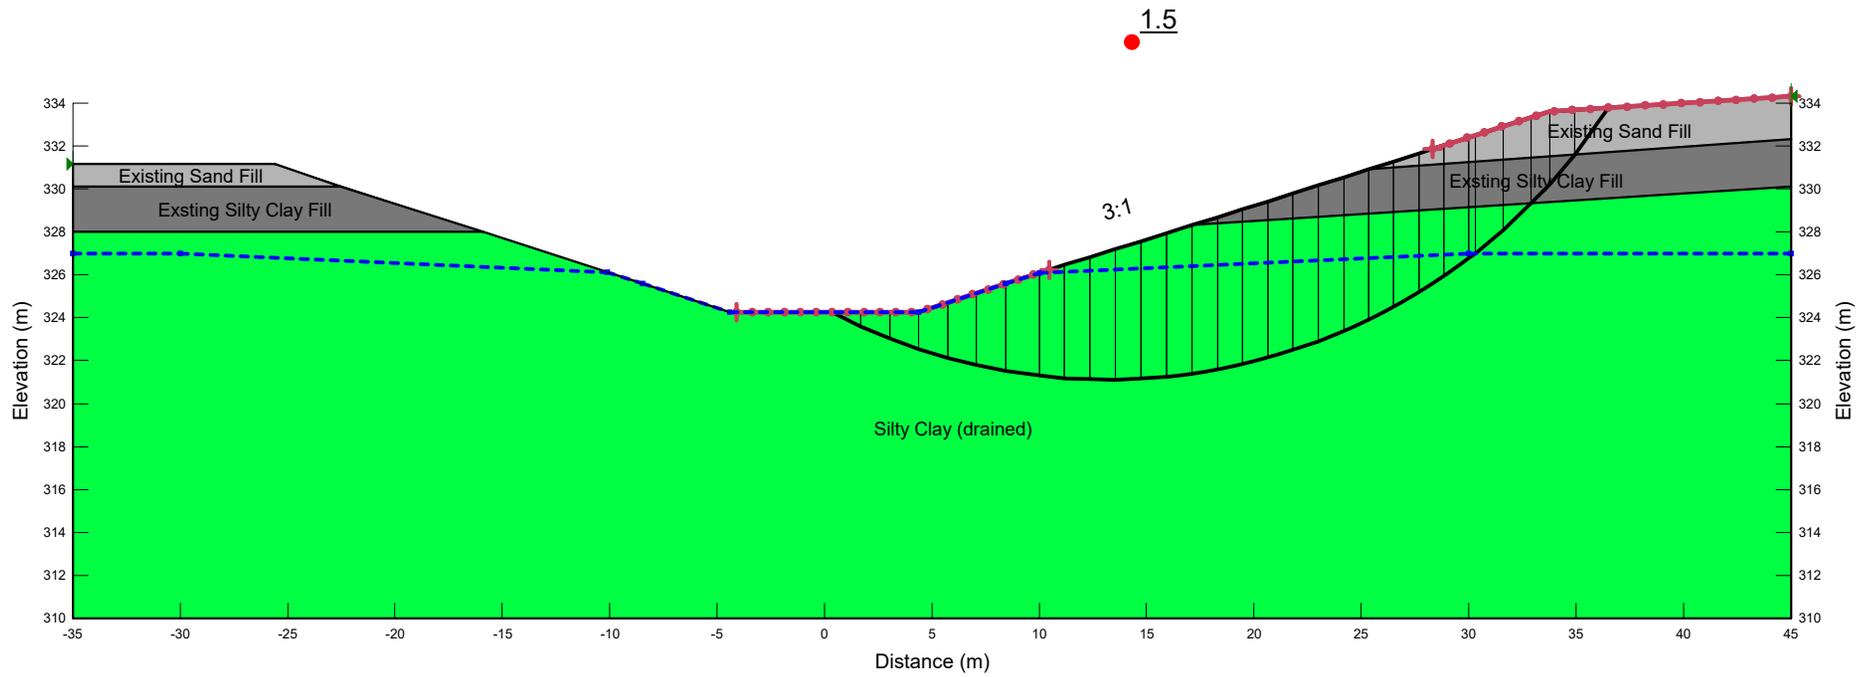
Lyon Creek Culvert Replacement - Temporary Excavation - Side Slopes 3:1 [Drained Analysis]
